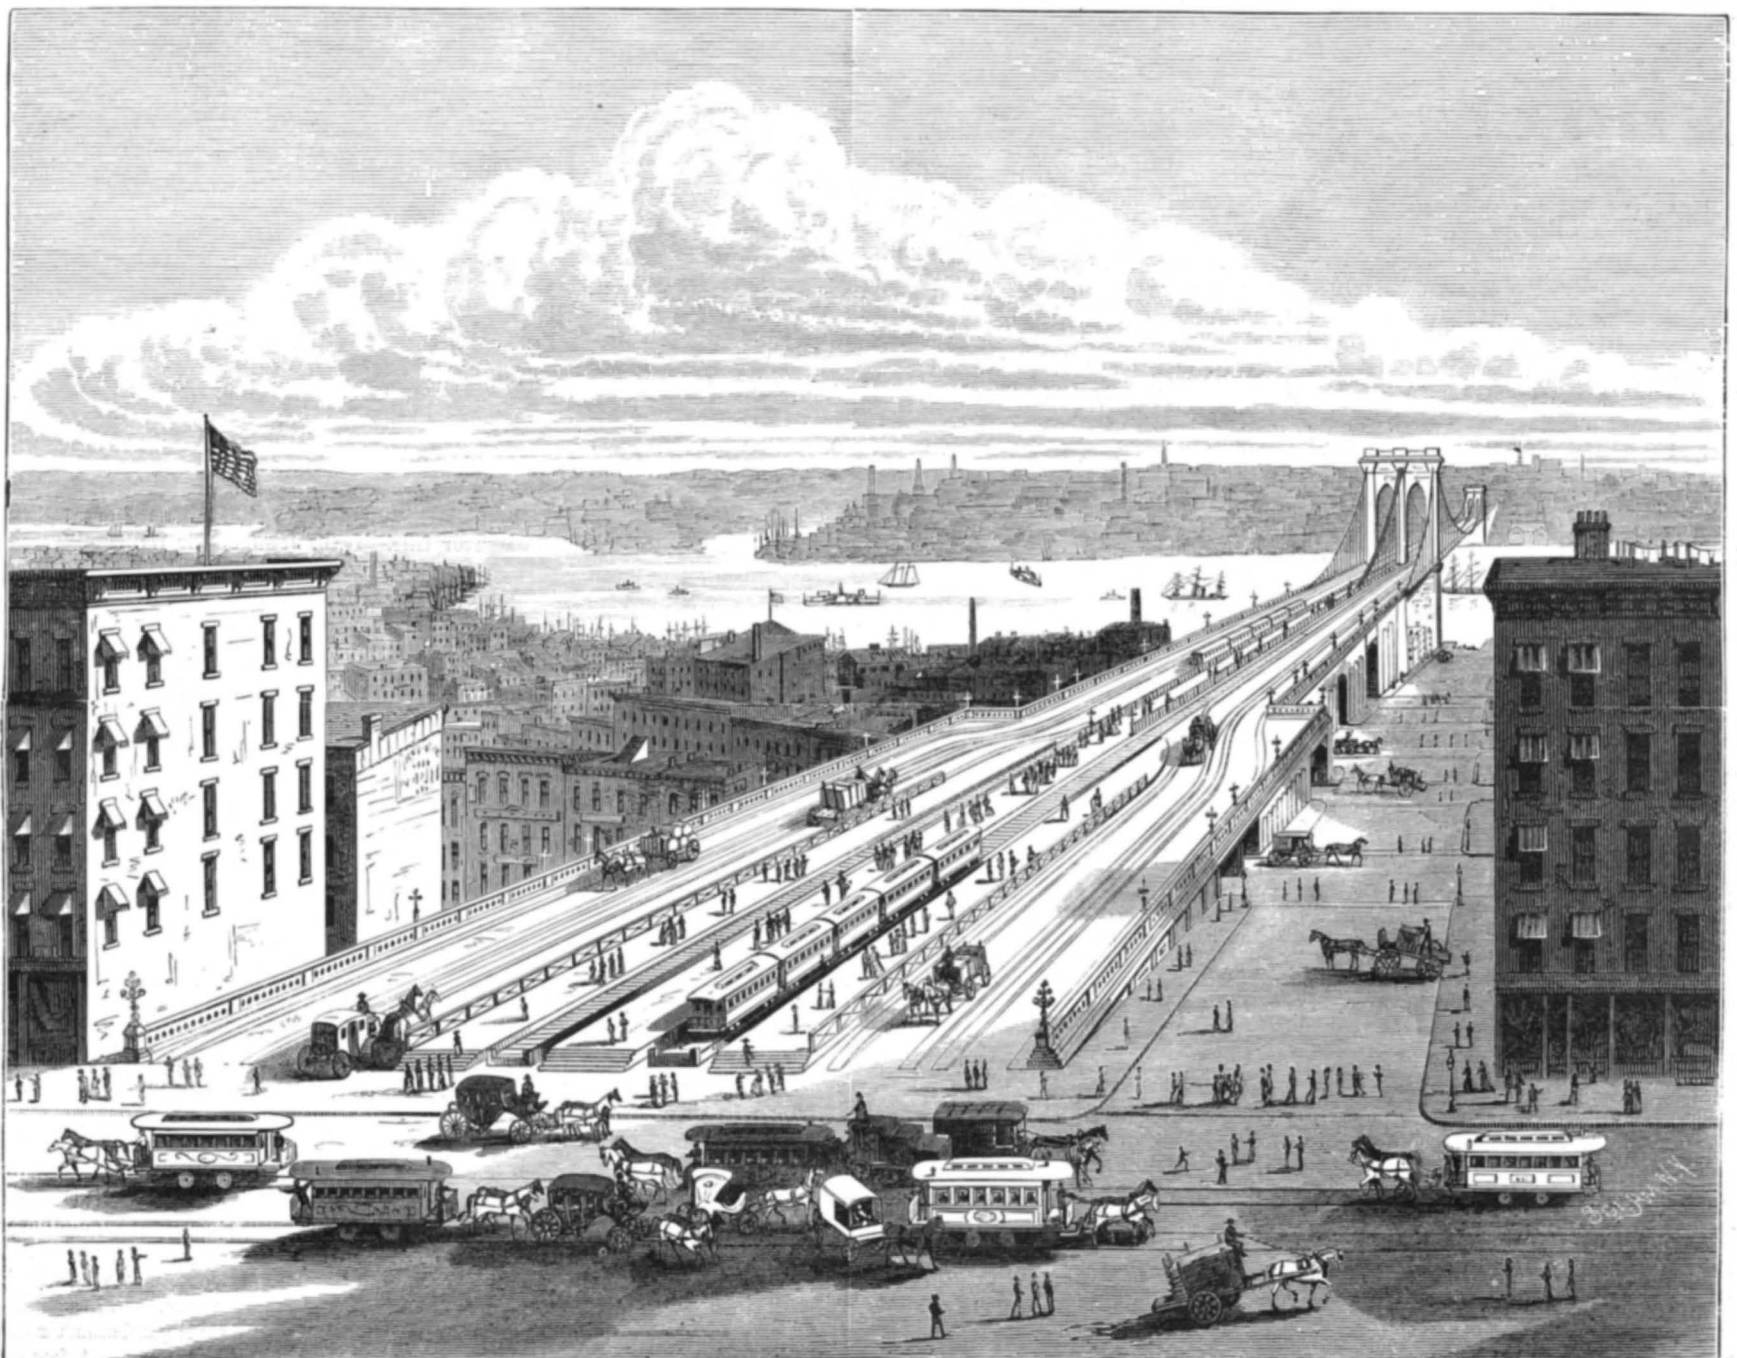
THE GREAT SUSPENSION BRIDGE BETWEEN NEW YORK AND BROOKLYN. THE BRIDGE ENTRANCE, NEW YORK SIDE.
